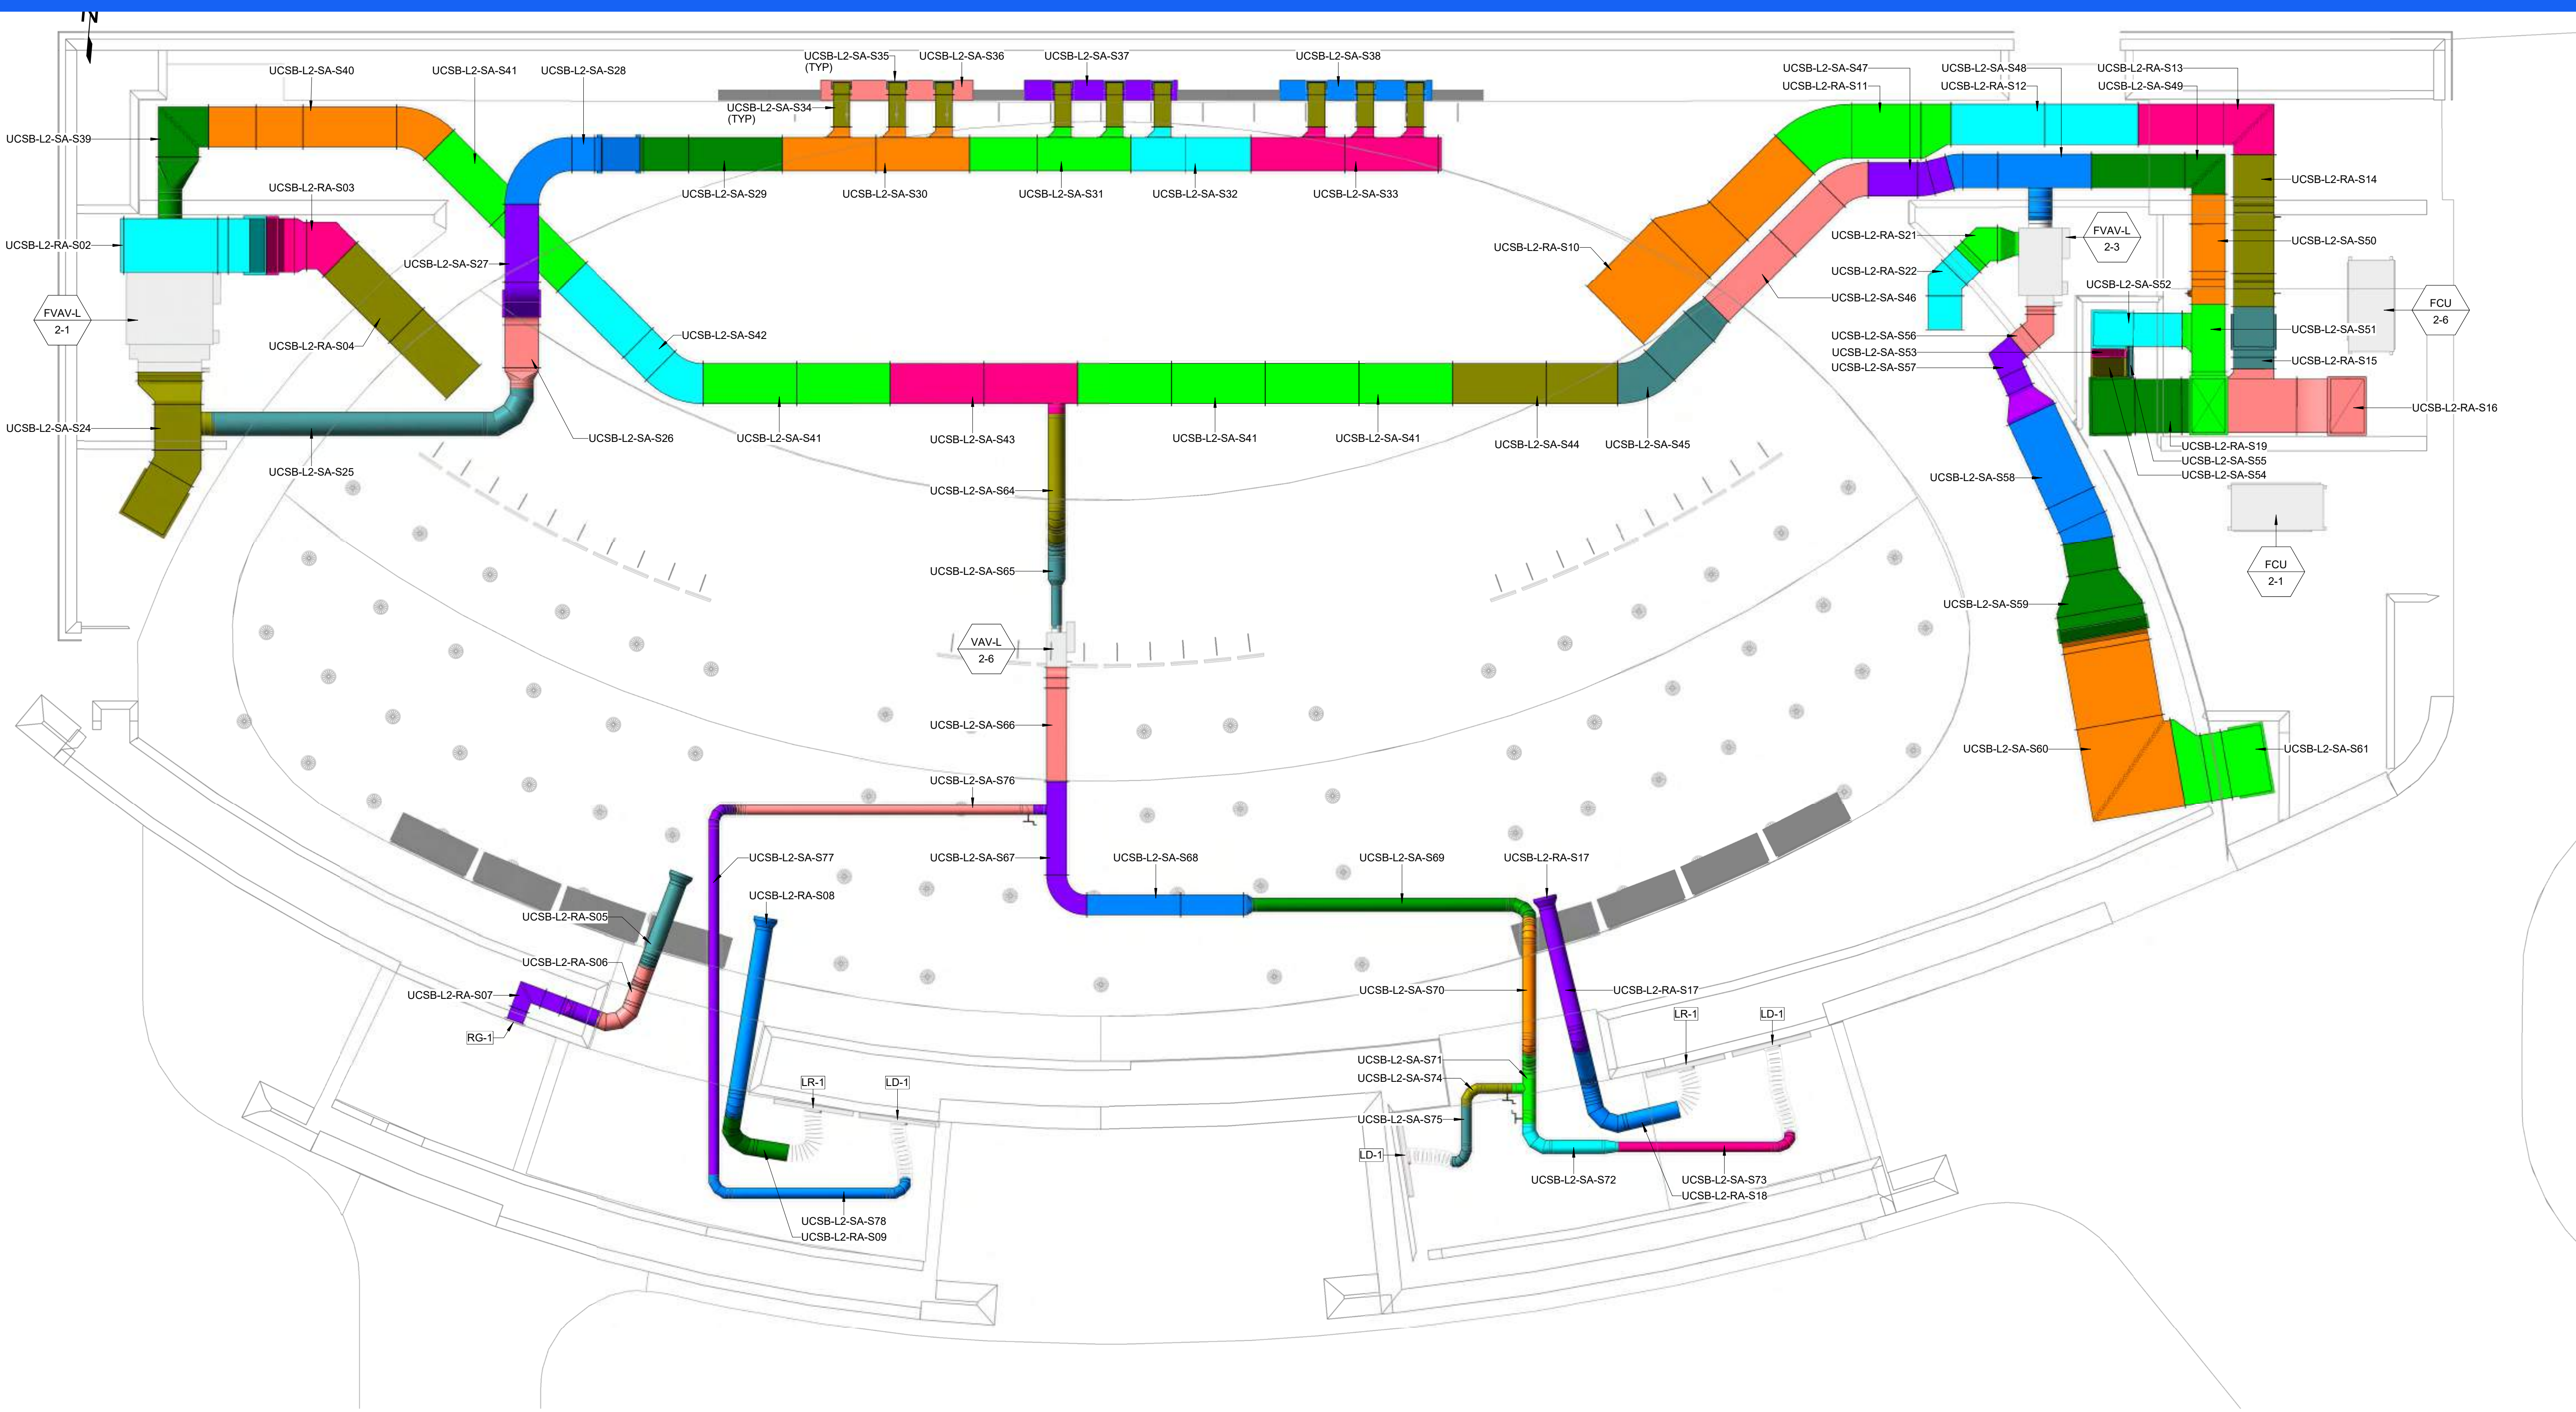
DETAILED DUCT ROUTING & LAYOUT - AREA P (HIGH)
